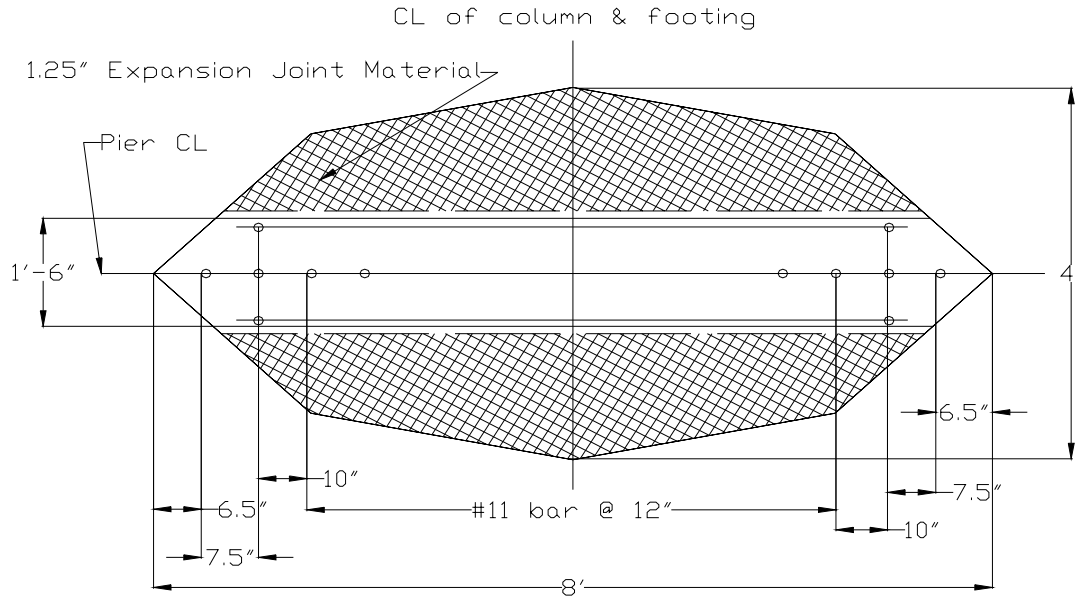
Detail of hinges on top of the footings of 1RWD off-ramp
